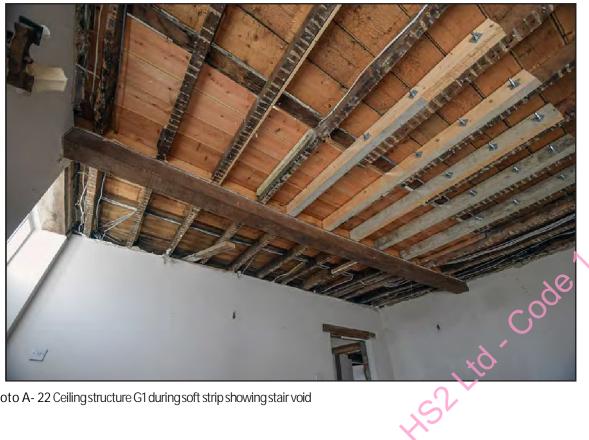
Ceiling structure G1 during soft strip showing stair void
